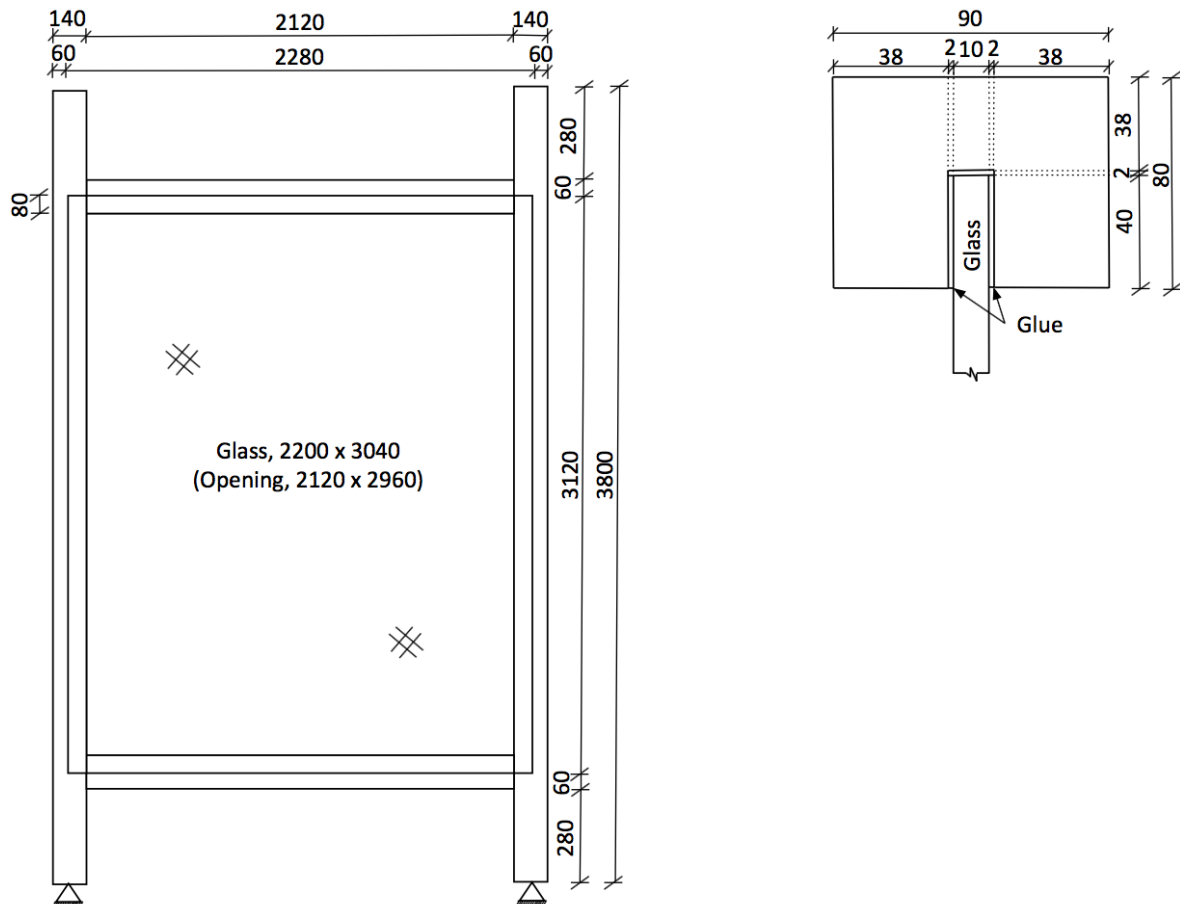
(left) Dimensions of the timber-glass frame (right) Cross section of the little frame with glass and glue
